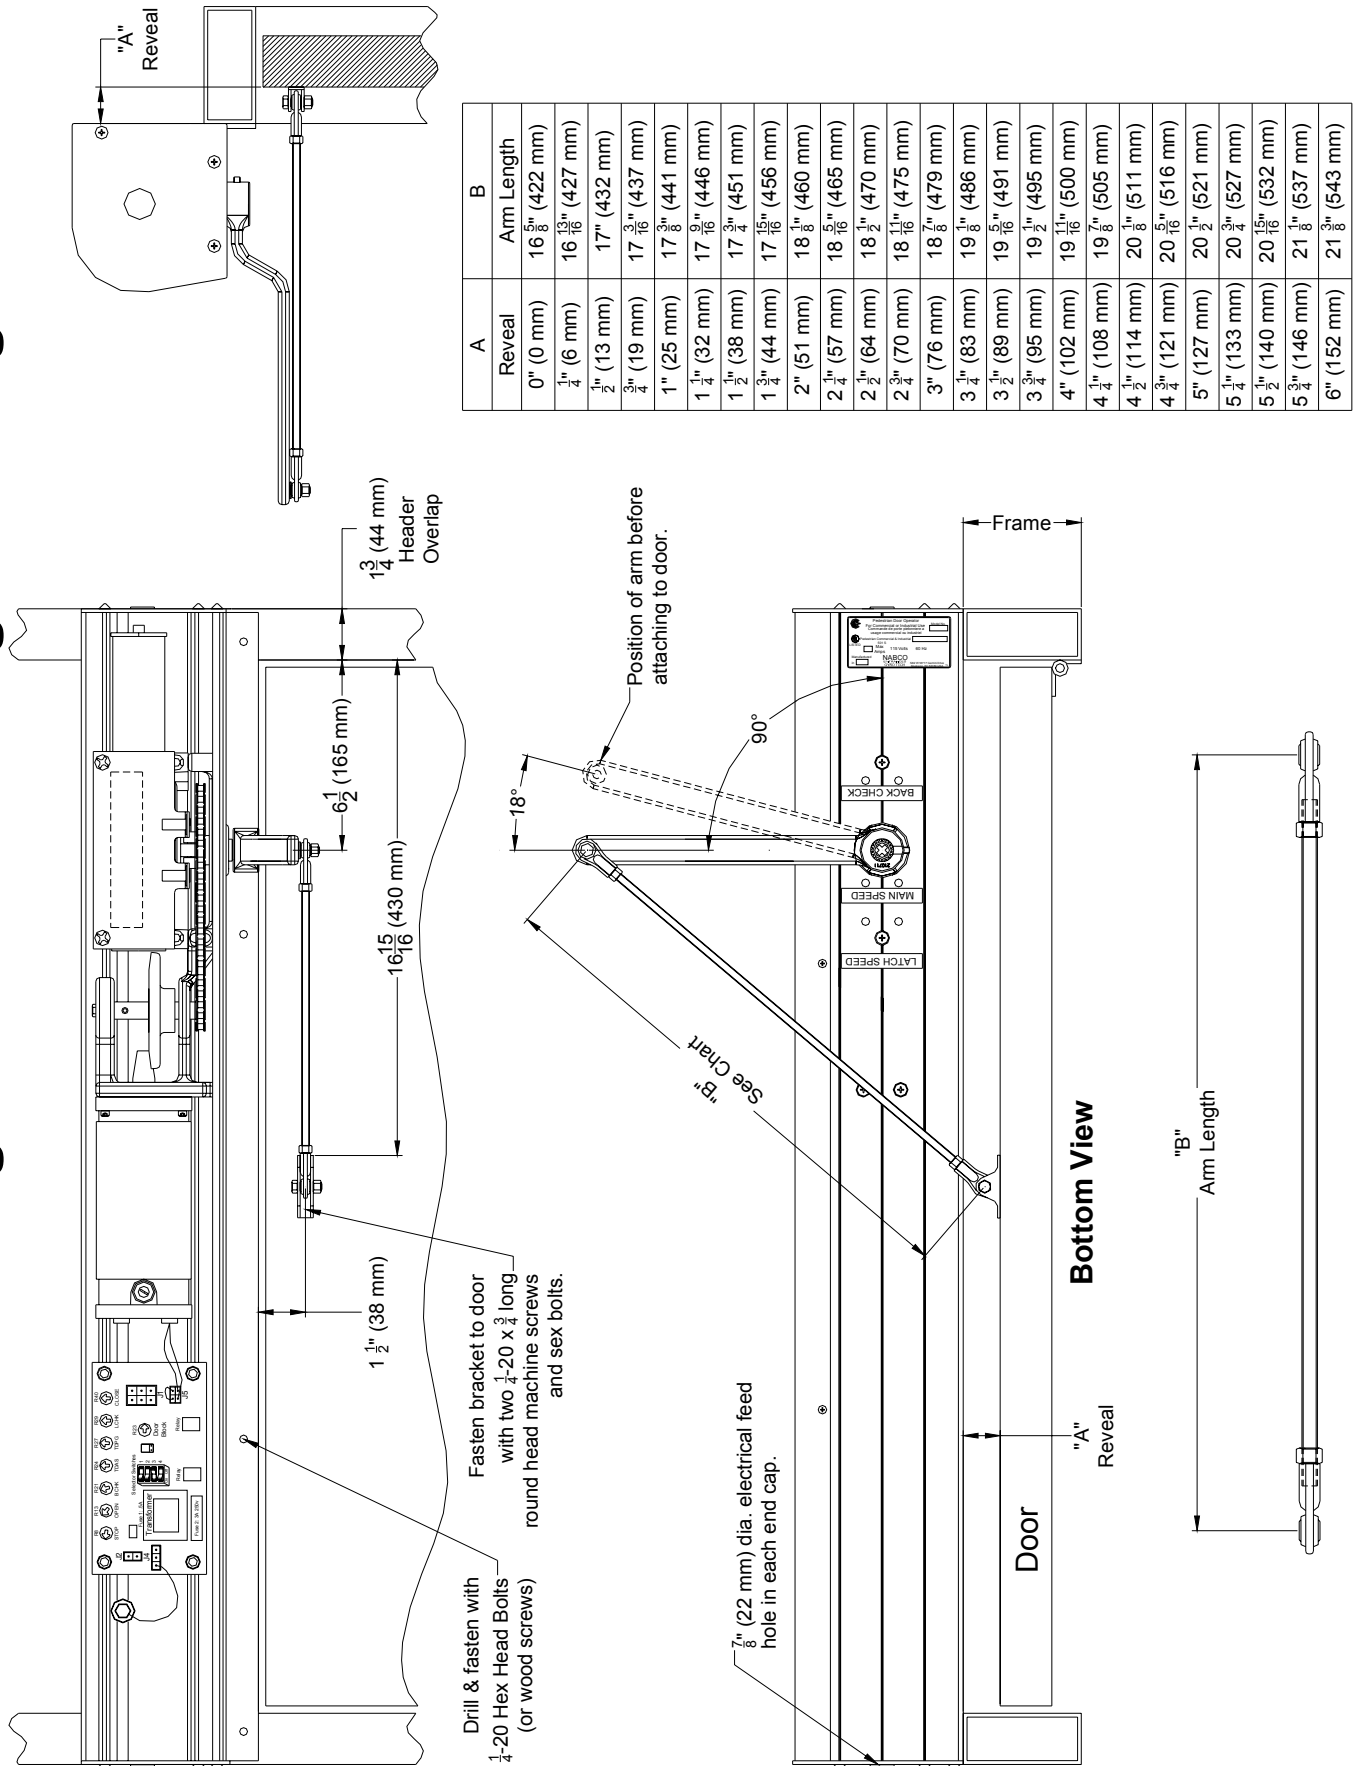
Installation Details, Right Hand Outswing Butt Hinge.
